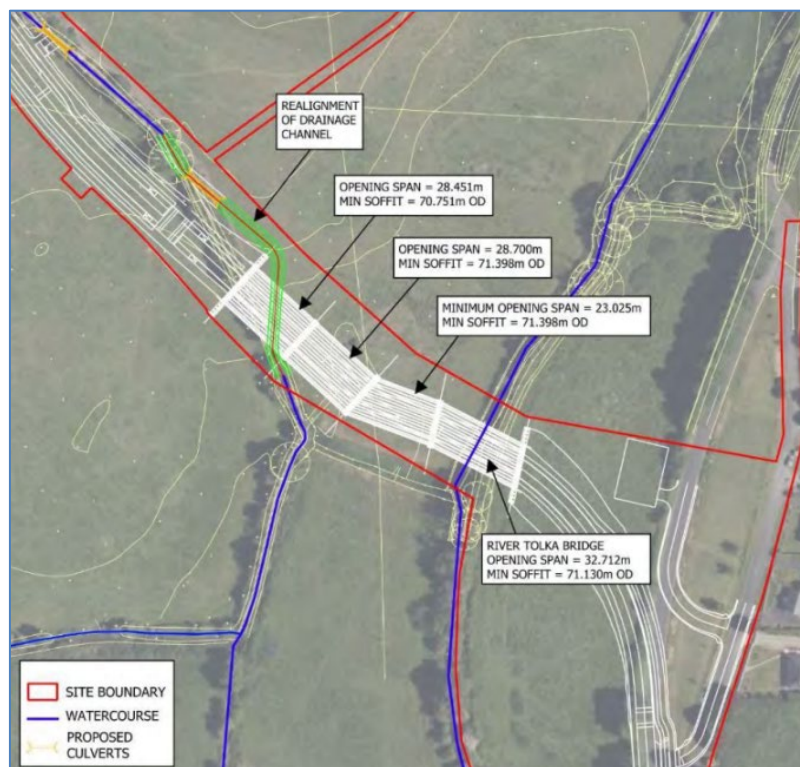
IMAGE SHOWING PROPOSED ROAD/BRIDGE AND DRAINAGE CHANNEL REALIGNMENT (SOURCE: IE CONSULTING SFRA)
